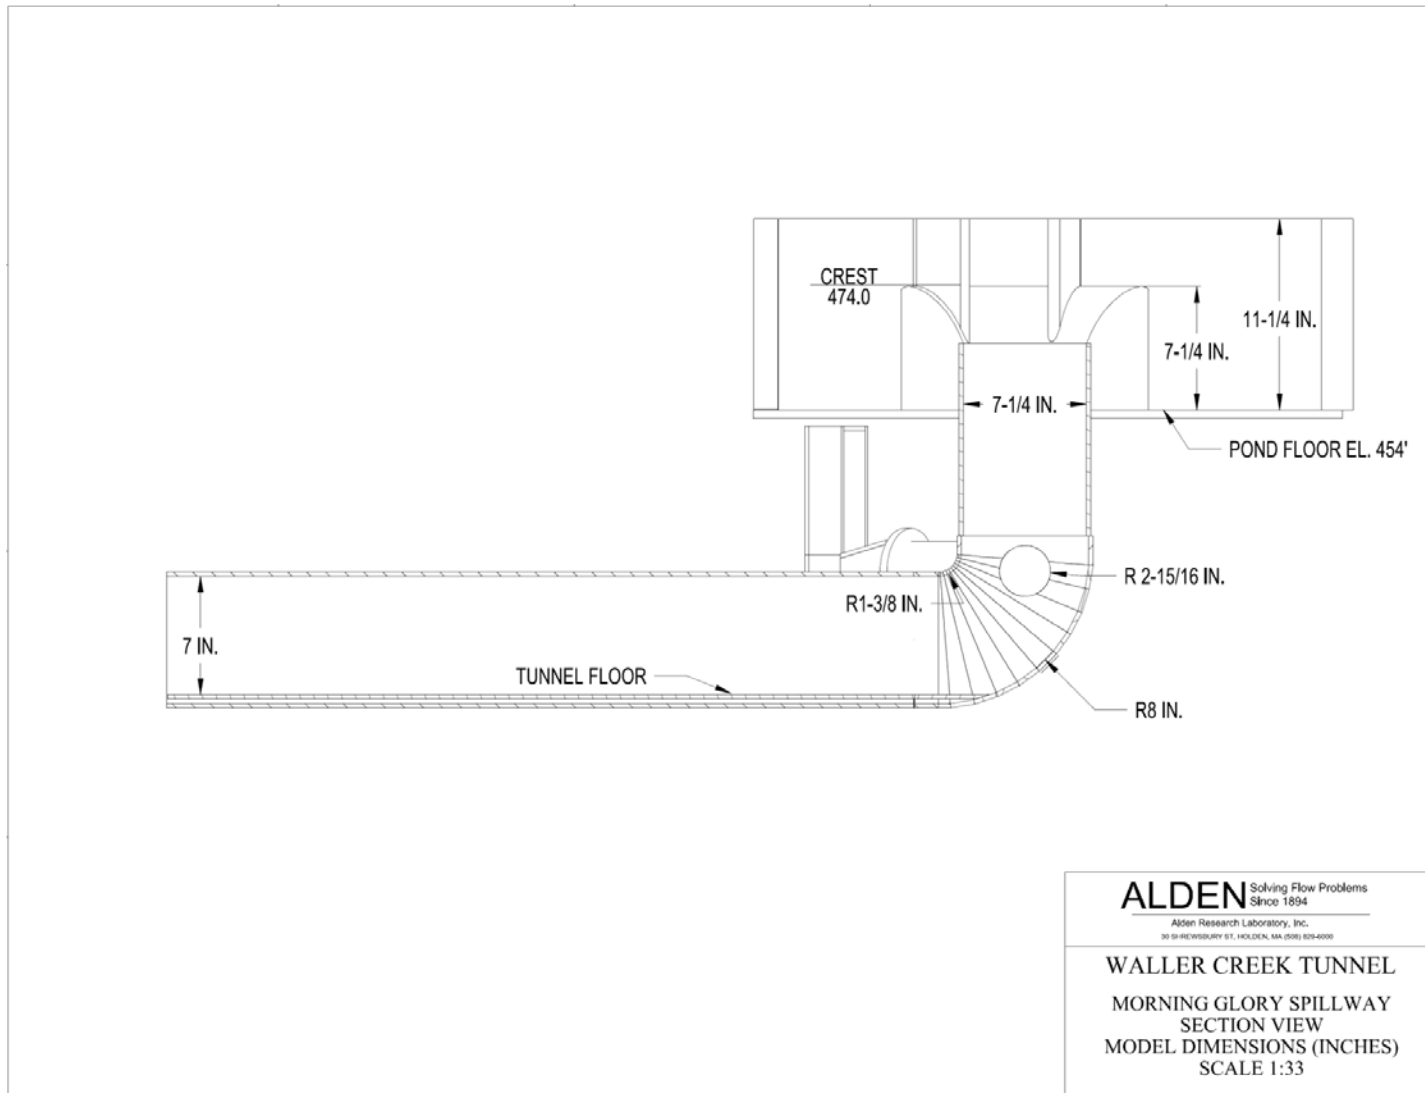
Waller Creek Tunnel Project; 1:33 Scale Model Morning Glory Spillway Dimensions – Section
